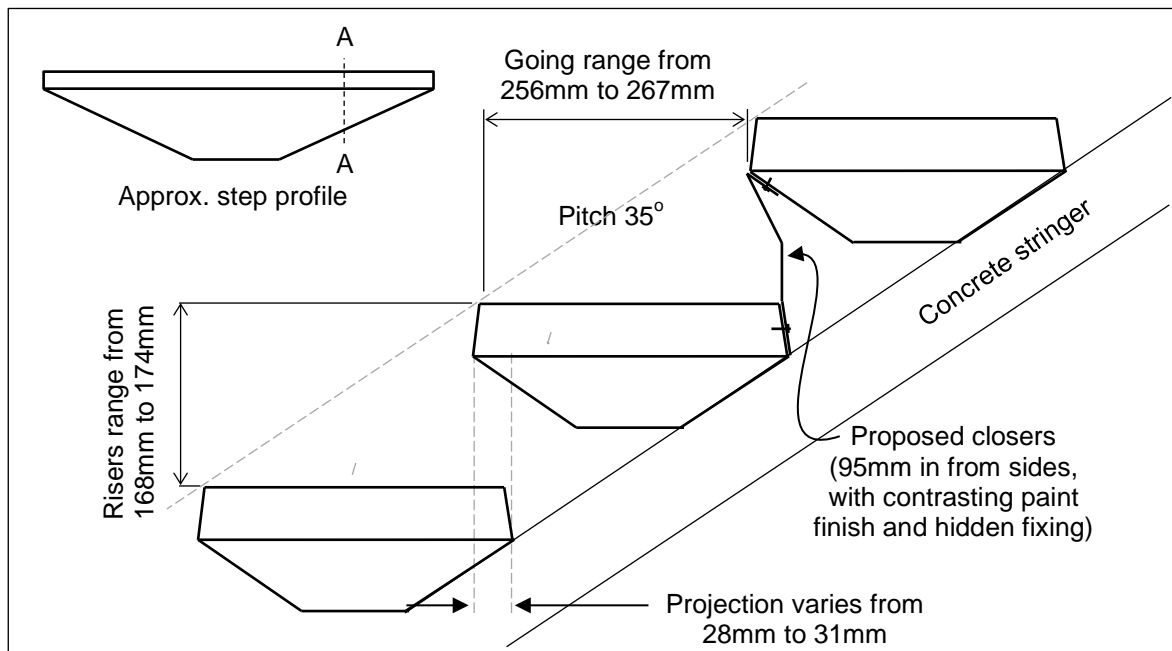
Sketch of stair A-A including closer (as proposed in building consent⁶)
